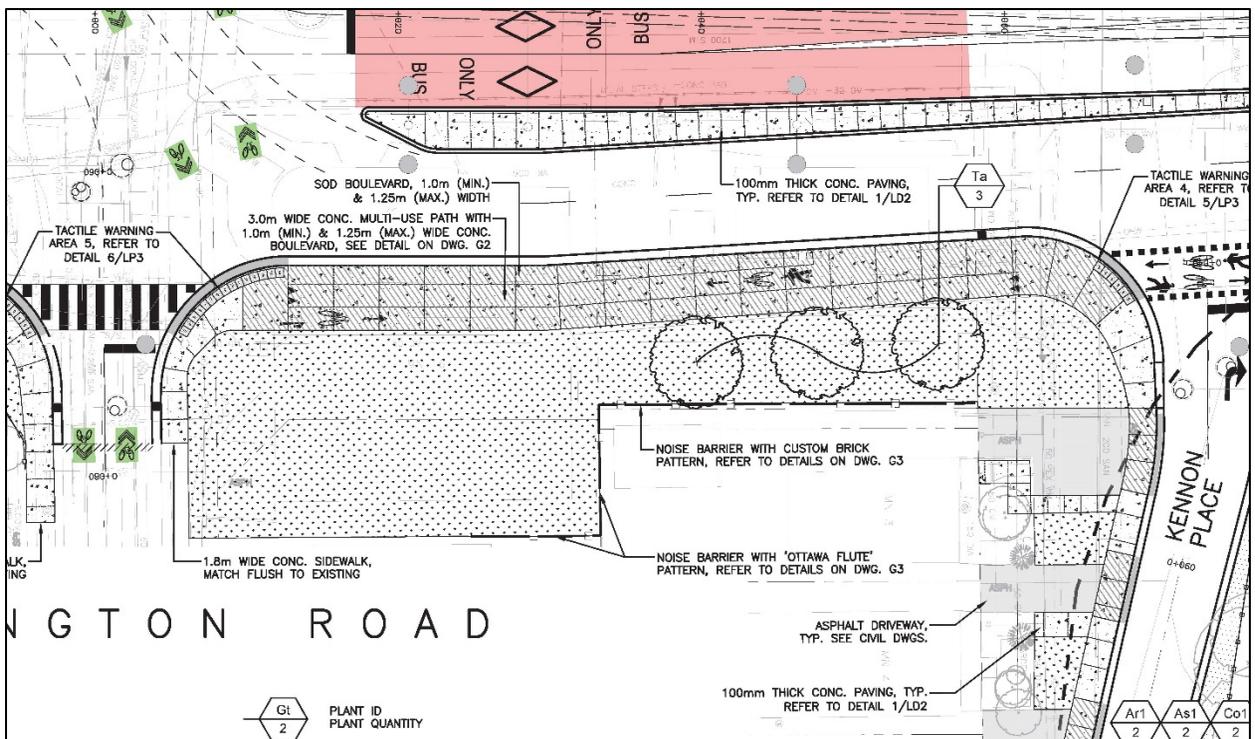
Detail from Wellington Gateway Construction Project Detail Design Drawings, showing proposed location of custom noise barrier wall (AECOM, Dillon Consulting, AGM, dated November 2023).
